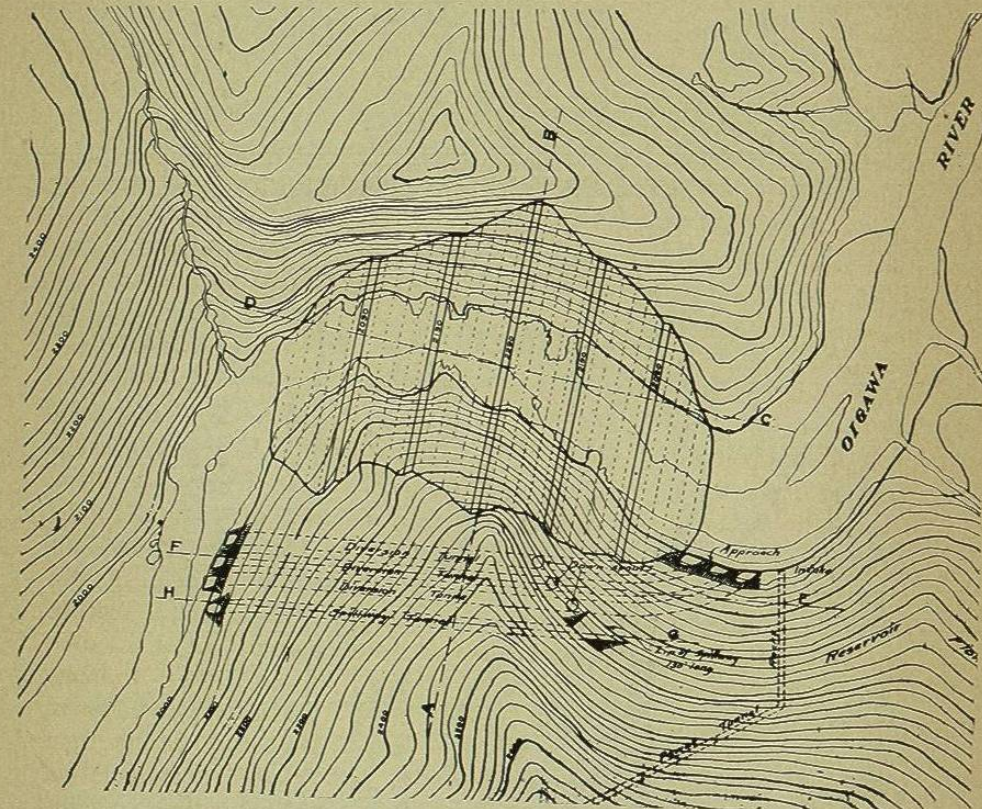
CONTOUR PLAN OF HYDRAULIC-FILL DAM PROJECTED FOR POWER STORAGE AT IKAWA ON THE OIGAWA RIVER, JAPAN.
